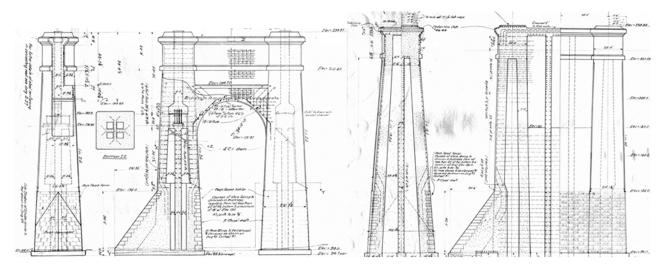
Piers 23 (left, 26 similar) and 24 (right, 25 similar) elevations showing hollow section.
